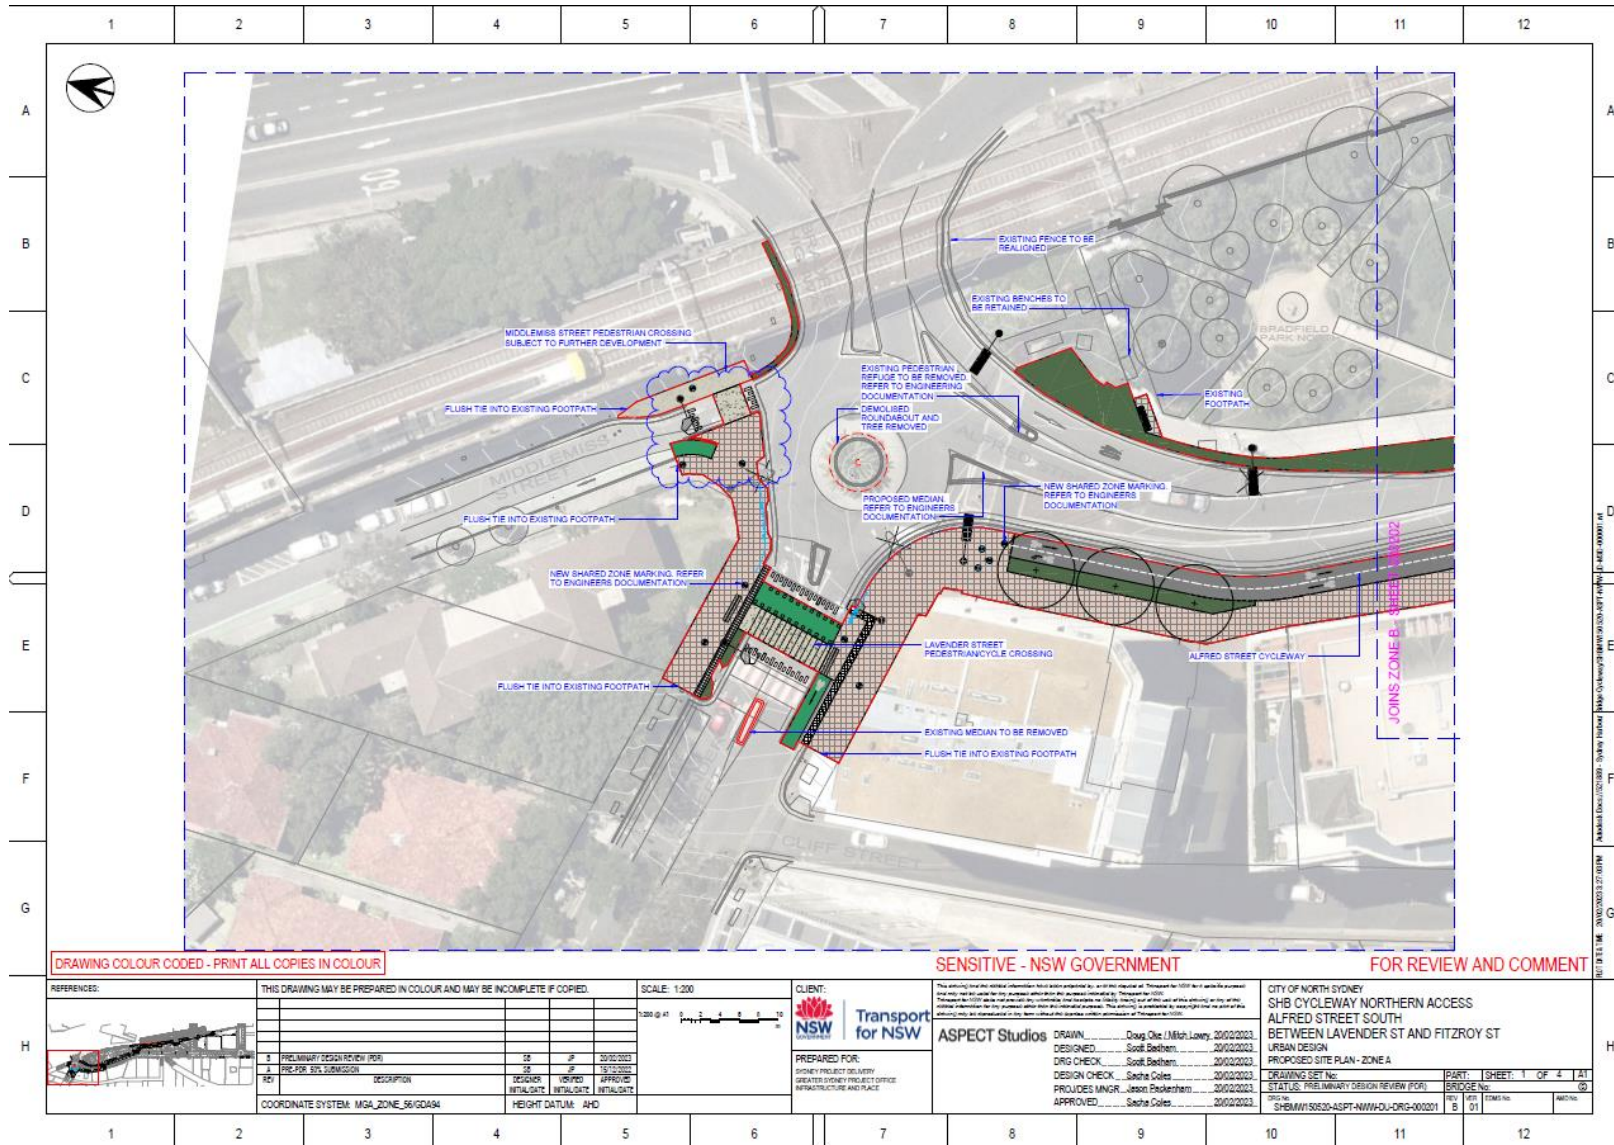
Proposed Site Plan – Zone A (Source: Aspect, 2023)
